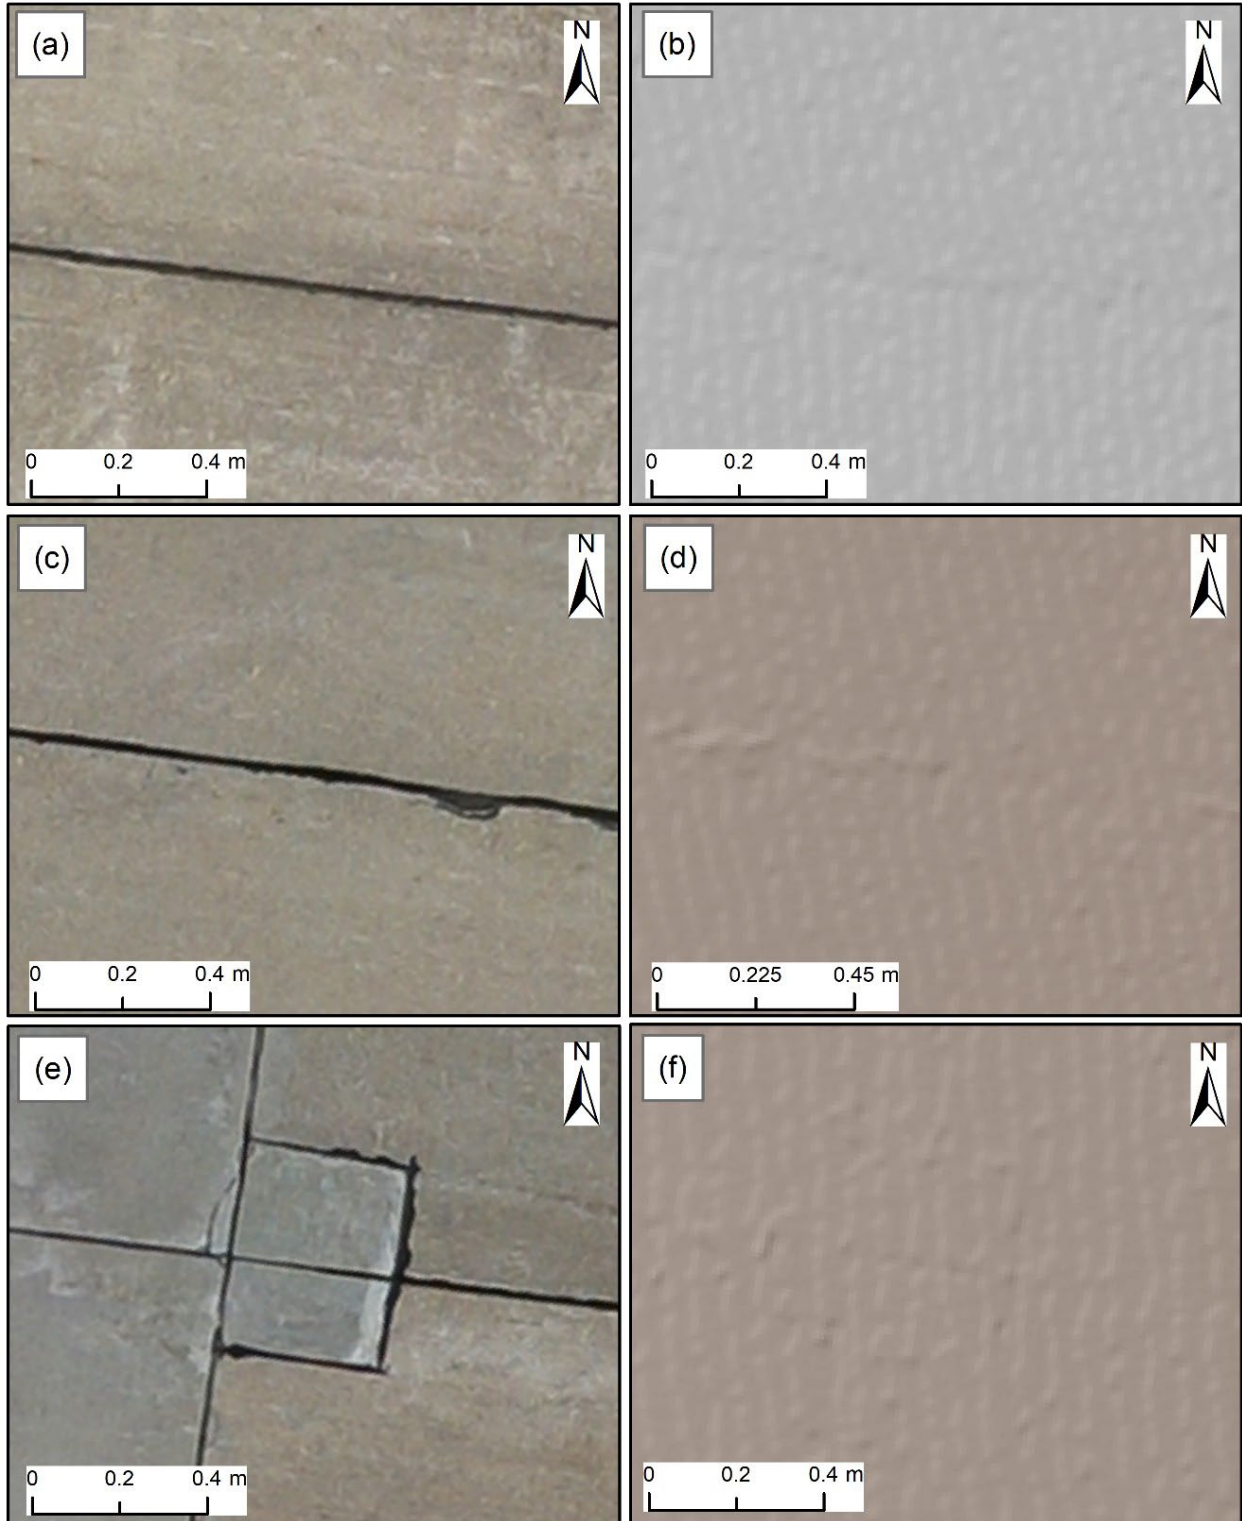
Joint Seal Damage (L) in (a) 2.5-mm/pix Orthophoto and (b) 10-mm/pix DEM; Joint Seal Damage (M) in (c) 2.5-mm/pix Orthophoto and (d) 10-mm/pix DEM; and Small Patching (L) in (e) 2.5-mm/pix Orthophoto and (f) 10-mm/pix DEM
